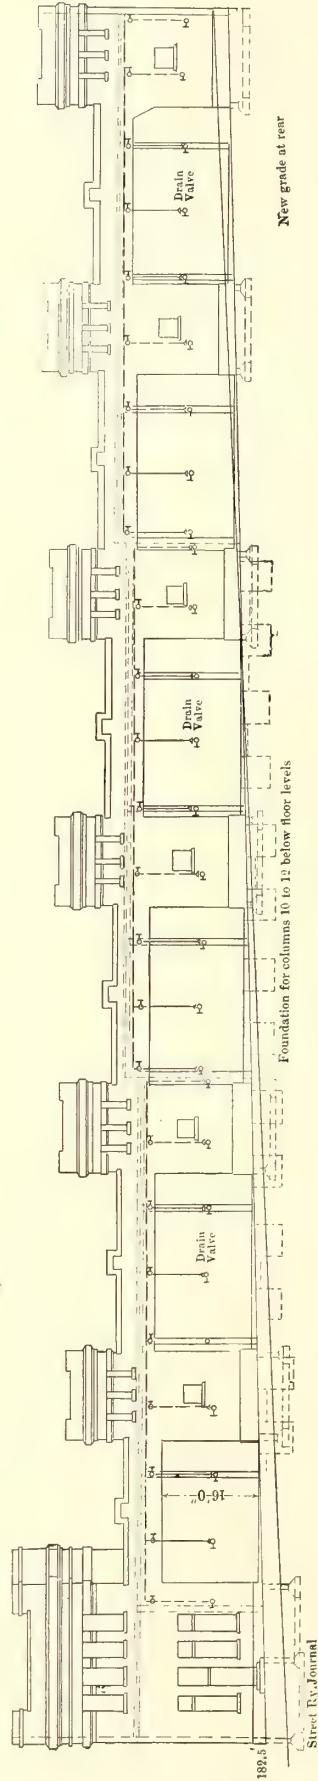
FRONT ELEVATION OF EDMONDSON AVENUE CAR HOUSE, SHOWING AISLE SPRINKLER
